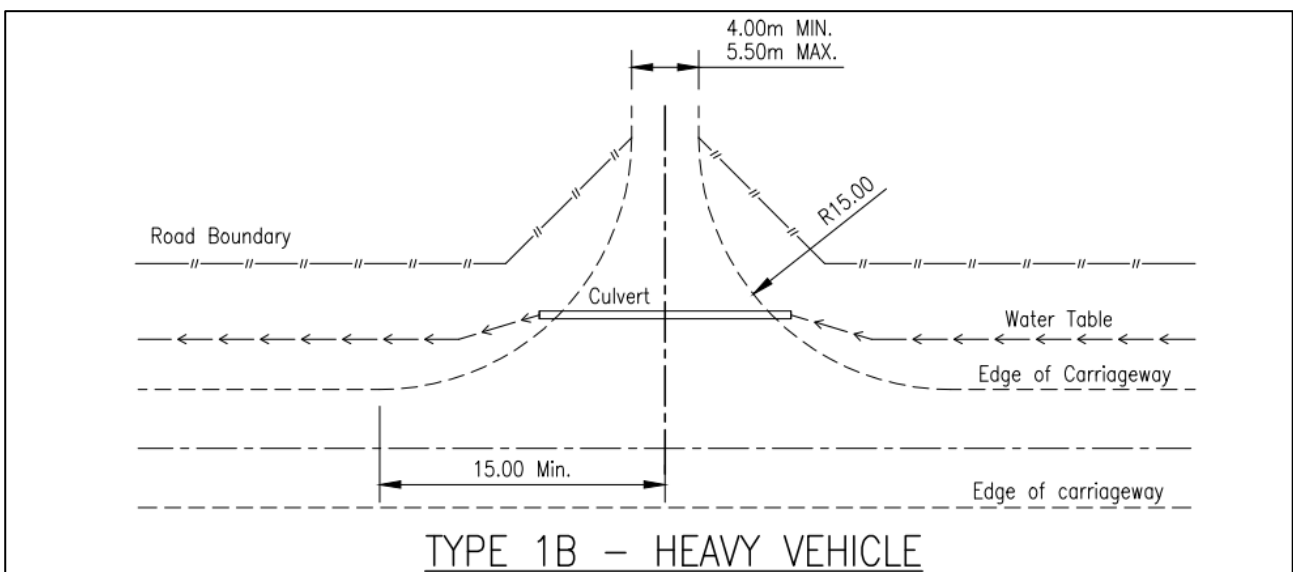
FNDC 2023 Engineering Standards 1B Crossing
